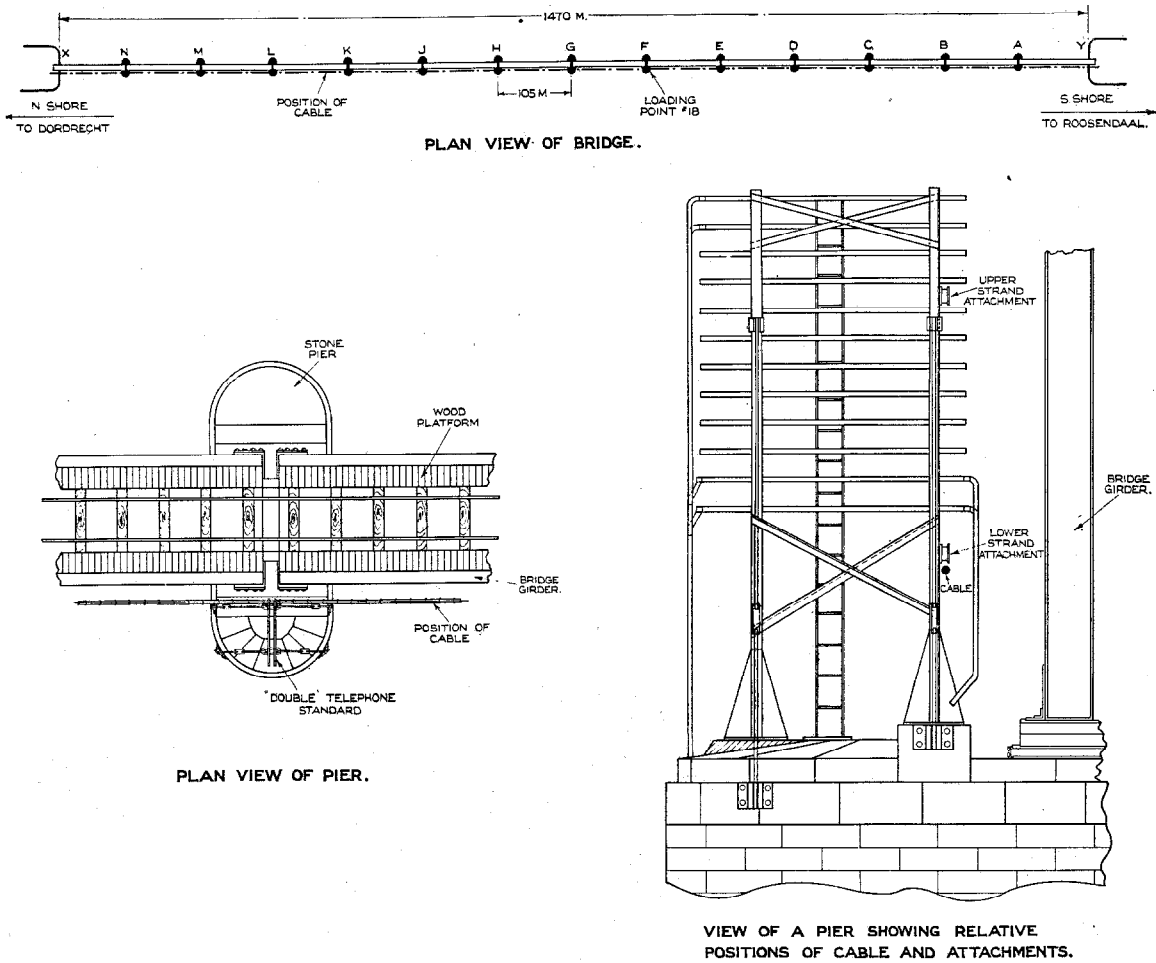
Plan of Bridge, showing piers, span lengths and position of aerial cable
